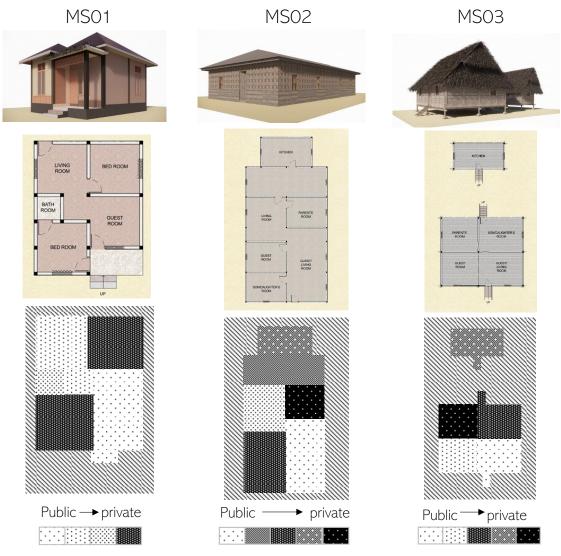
MS's houses in Nggorang with 3D render, floor plan and layout analysis
